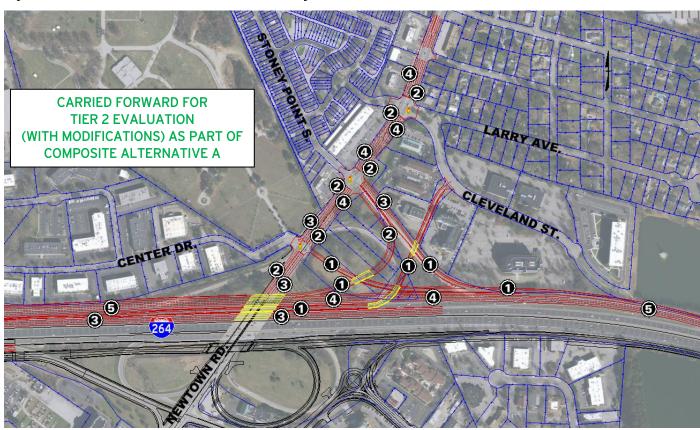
Tier 1 I-264/Newtown Road Interchange Alternative 1
